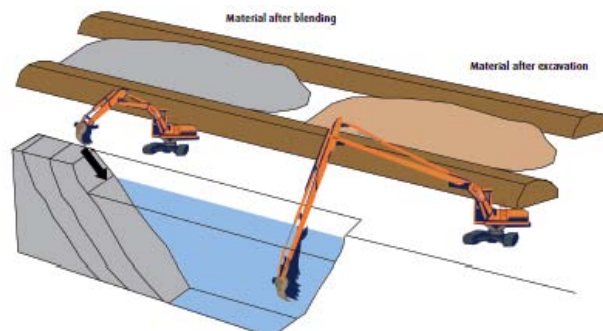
Schematic of slurry wall excavation under bentonite slurry
